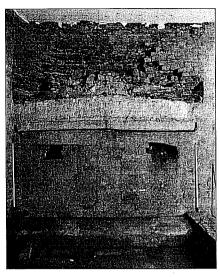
Original kitchen (B32) north wall (Archive - Photo 13)
